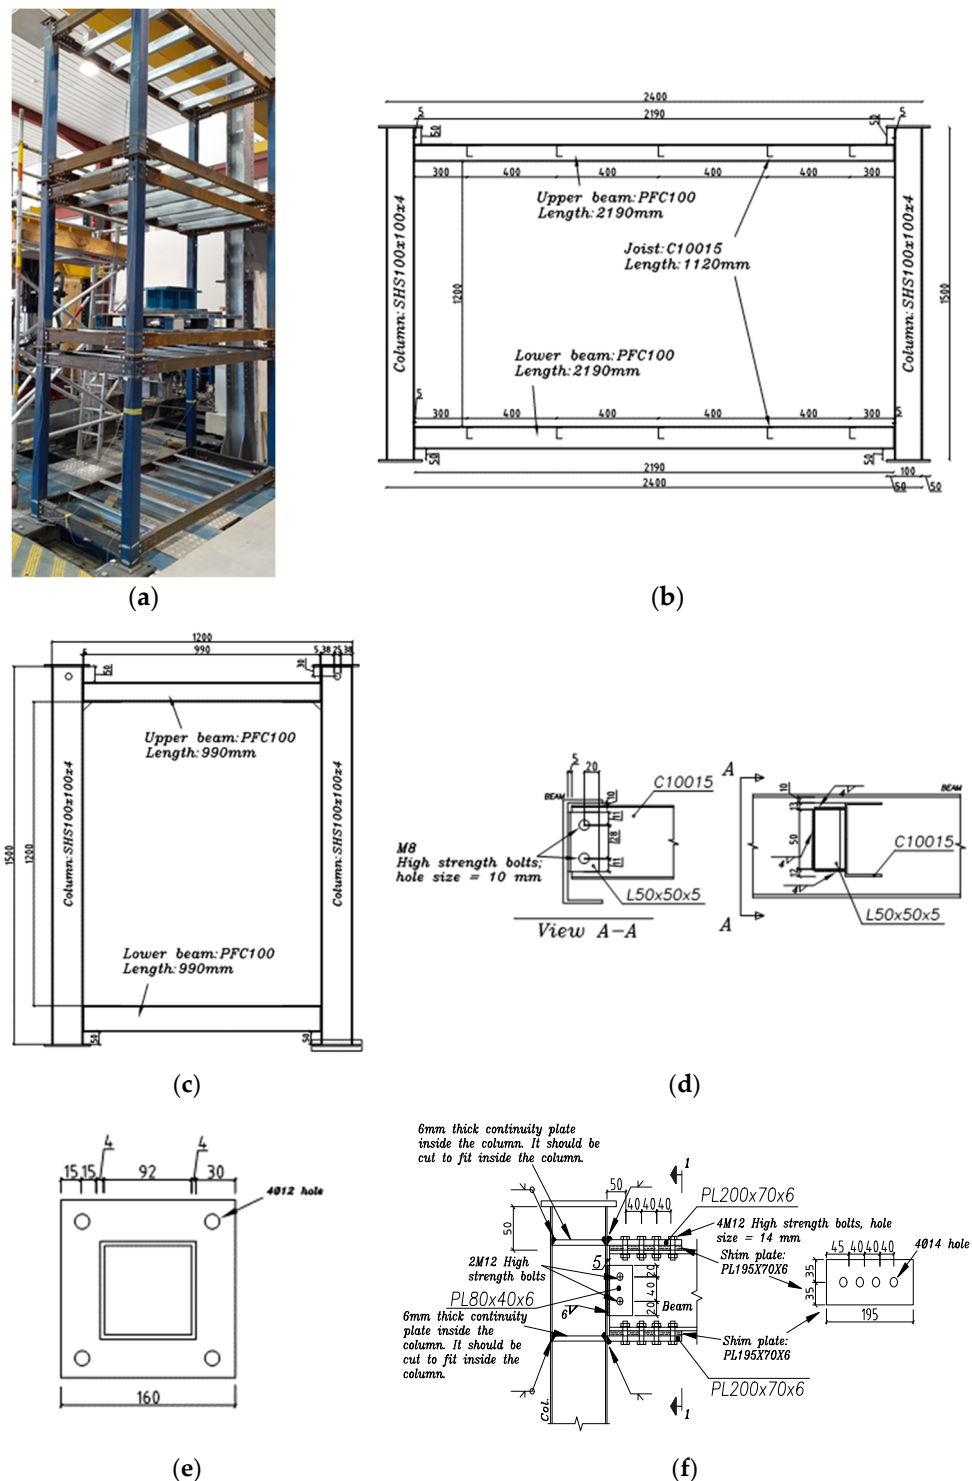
(a) Three-dimensional view of the test specimen; (b) details of a modular unit in the longitudinal direction; (c) details of a modular unit in the transverse direction; (d) details of joist connections; (e) details of inter-connections; (f) details of intra-connections.
